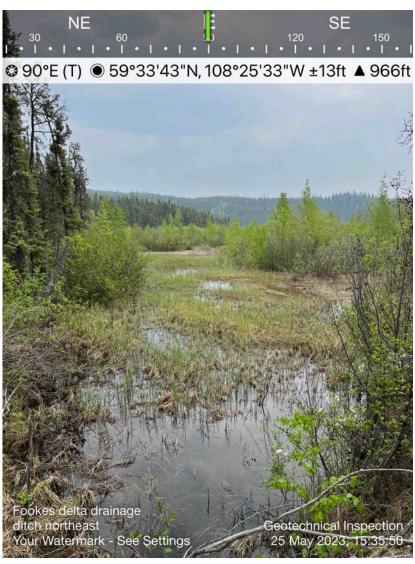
Drainage collection area on edge of Fookes Tailings Delta approximately 100m from access point
